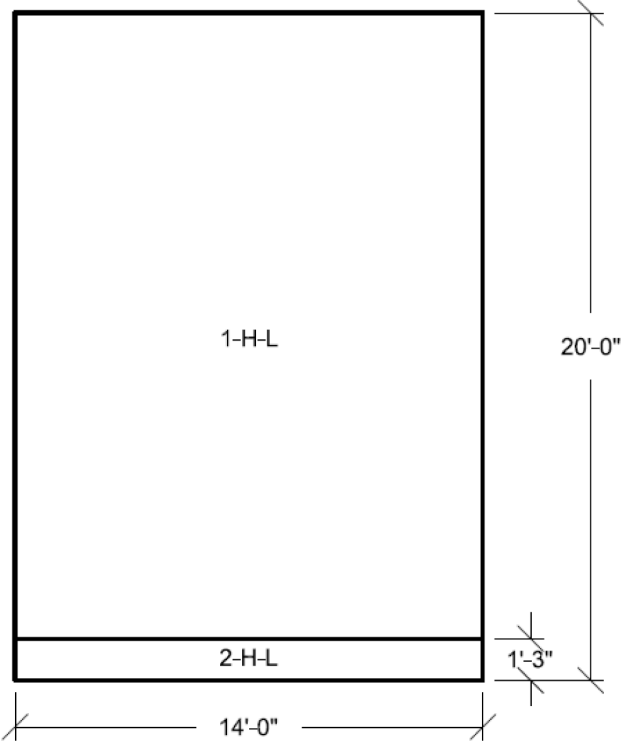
H.6-177 DGFOV Wall 10 Looking From Outside Horizontal Reinforcement Zones Near Side Face
